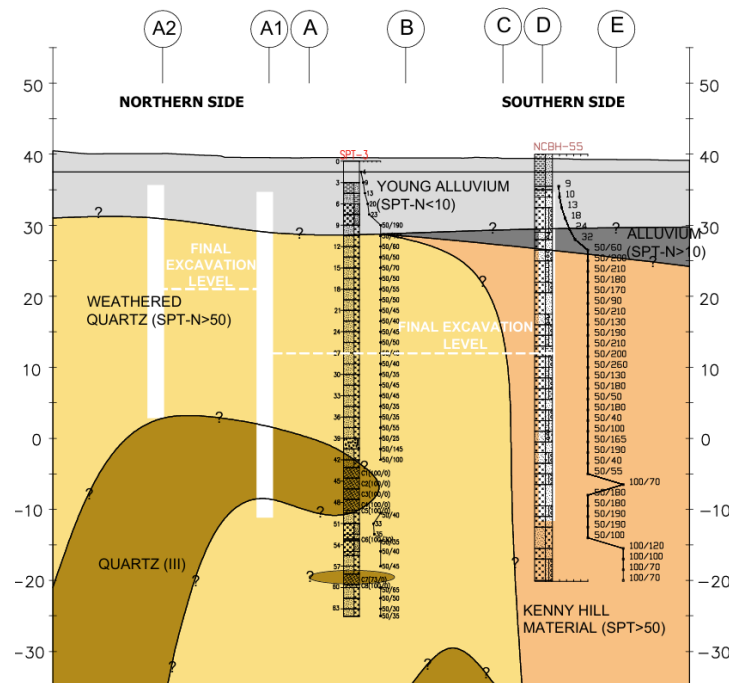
Inferred transverse subsurface profiles at Section A-A.
